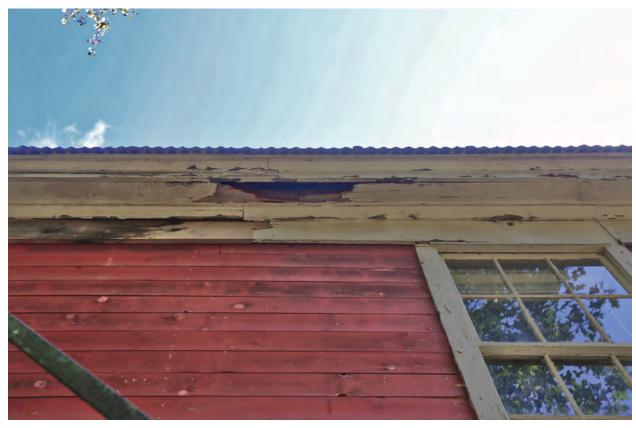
North elevation, detail of the soffit shown in Figure 10.
